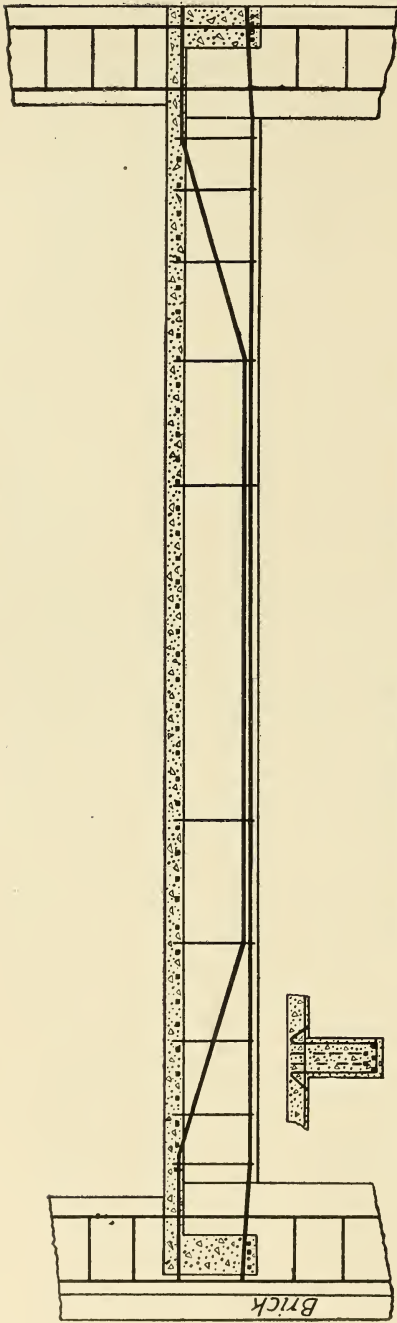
a. Detail of Beams, Mershon Building, Philadelphia, Pa.
